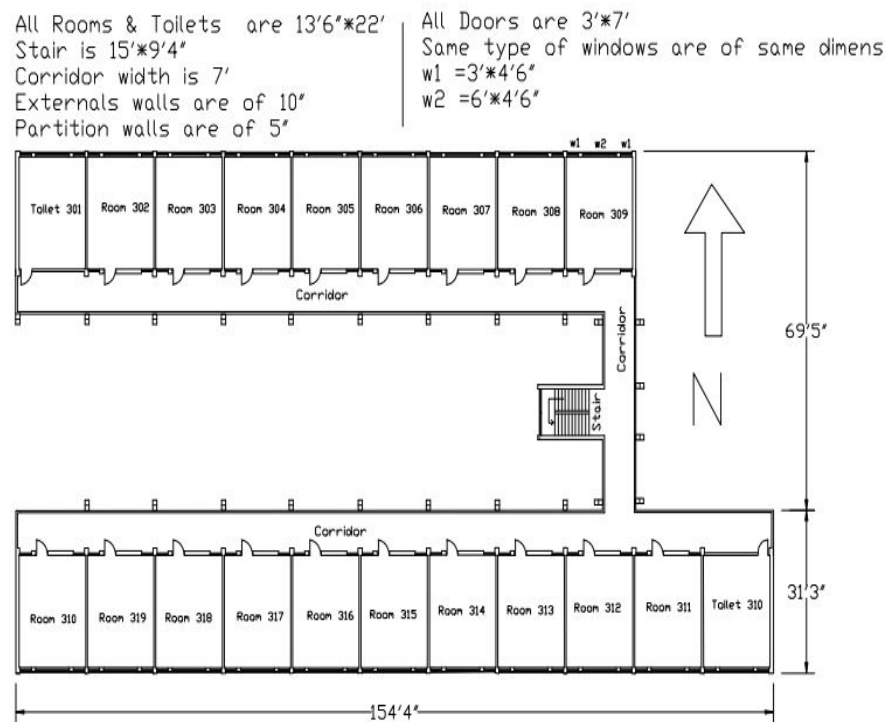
Plan of Dr. M. A. Rashid Hall (2nd floor)
